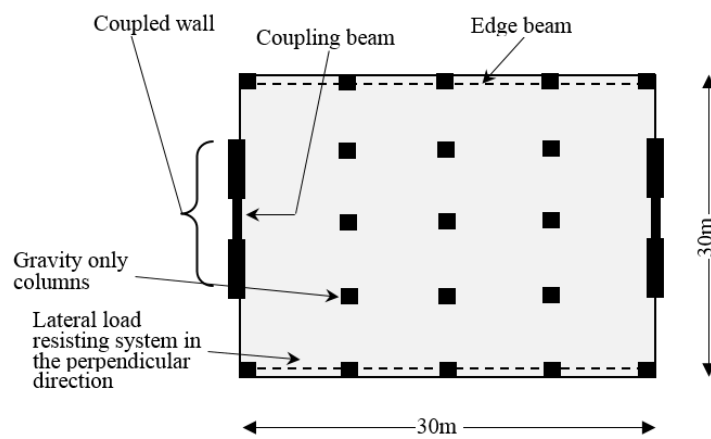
Typical building plans in high rise construction (common in U.S. (NIST GCR12-917-18))
